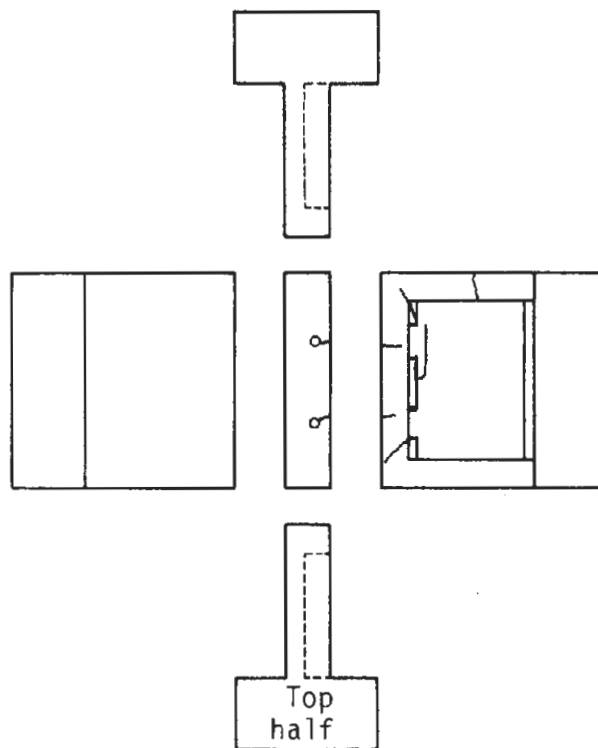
CRACKING OF SPECIMEN J-1 AFTER TEST
